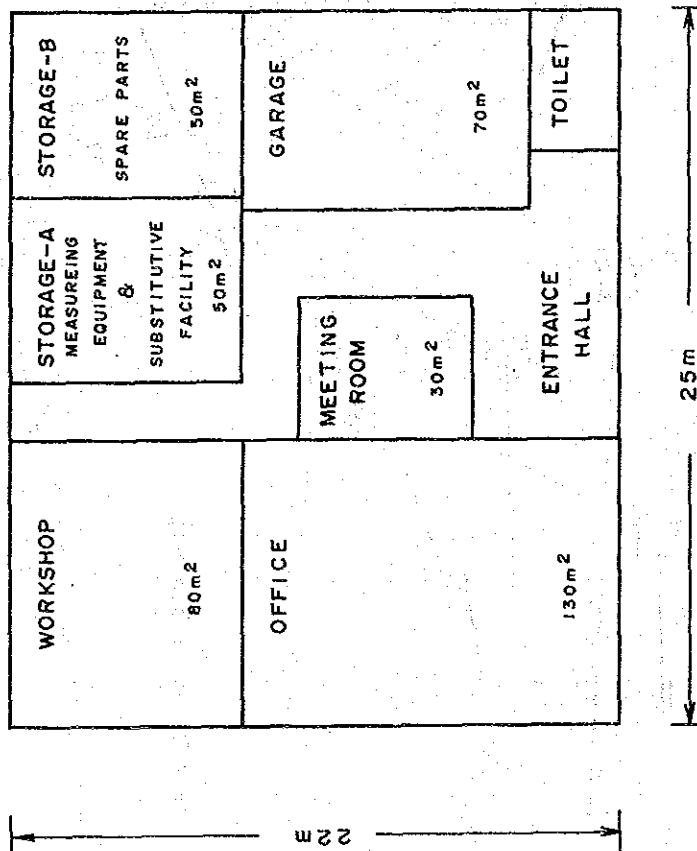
The Floor Layout of MEDAN Regional EC 1
